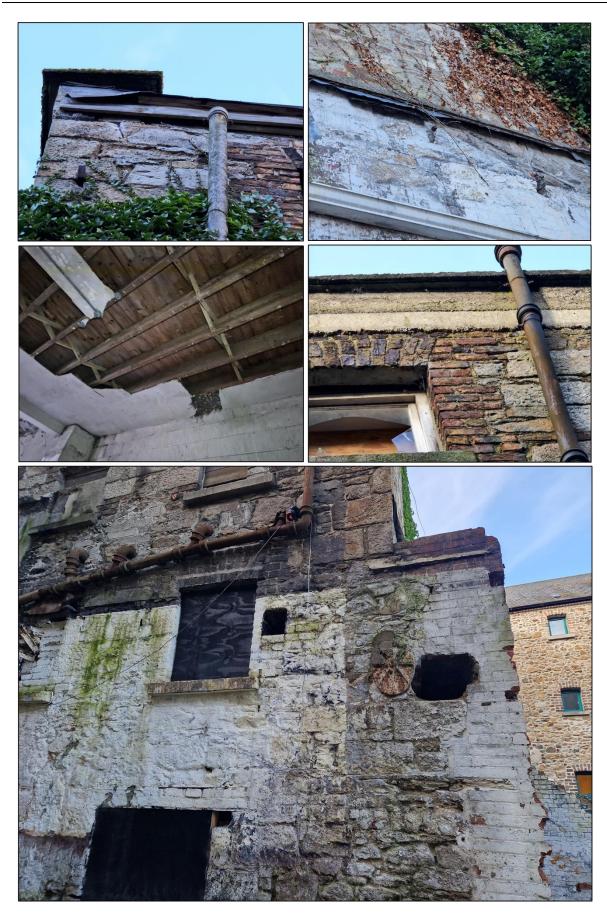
EXTERNAL AND INTERNAL PRFS WITHIN THE BUILDING. THESE INCLUDE, MASONARY CRACKS, LIFTING LEAD FLASHING, GAPS WITHIN FACIA BOARD, VOID SPACES BETWEEN FLOOR JOISTS AND HOLES WITHIN BUILDING ENVELOPE.
